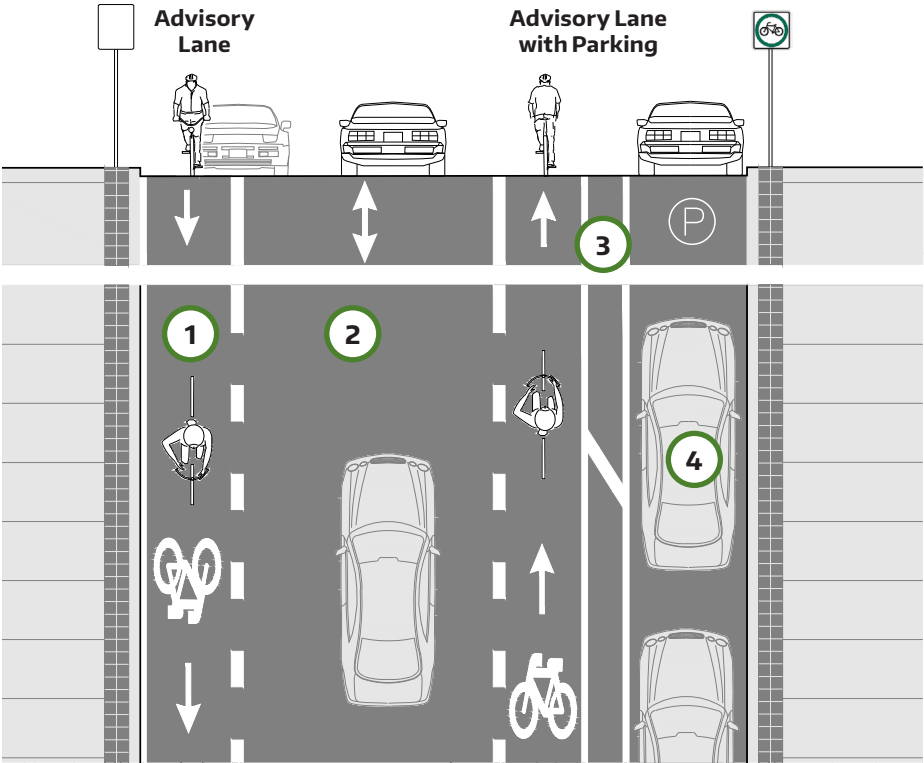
Plan view and street section of advisory bicycle lanes with and without parking.
